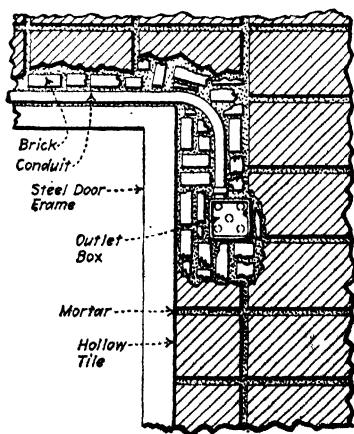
Arranging conduit outlets in existing tile partitions.
